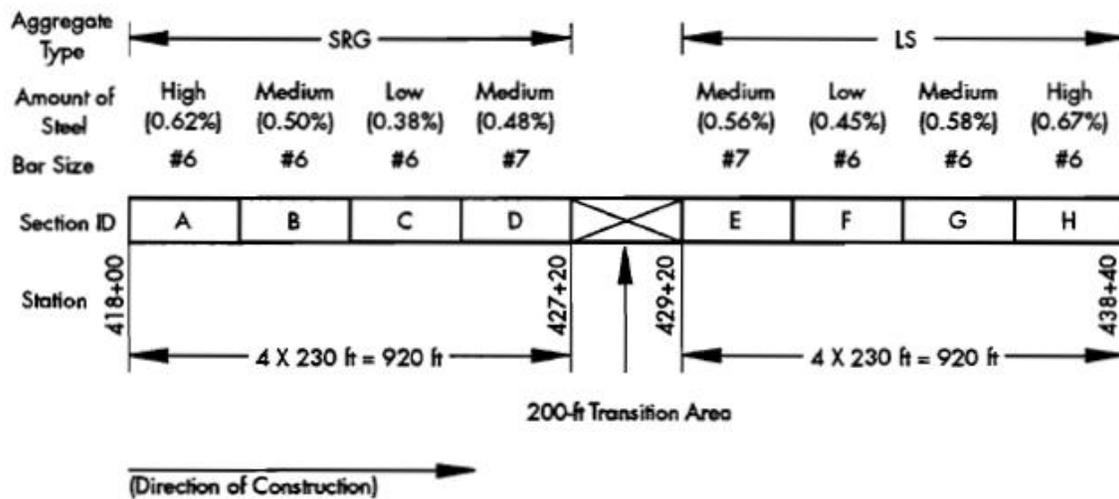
Layout of Test Sections in BW 8 Frontage Road
